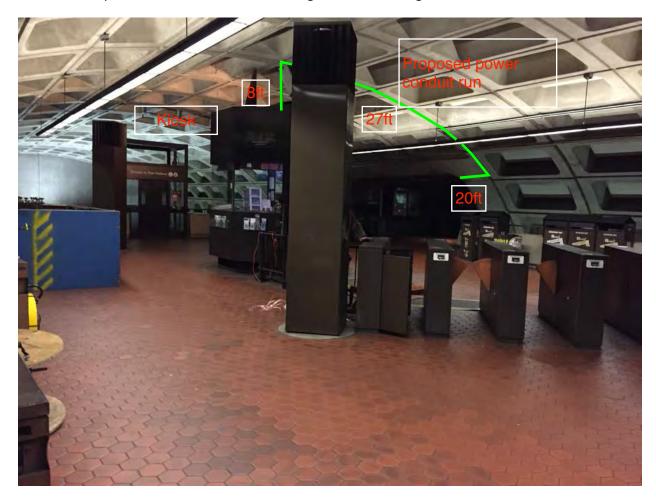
Proposed conduit run from kiosk along mezzanine ceiling and wall
